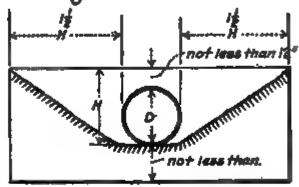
METAL PIPE CULVERIS. STATE OF IOWA.
